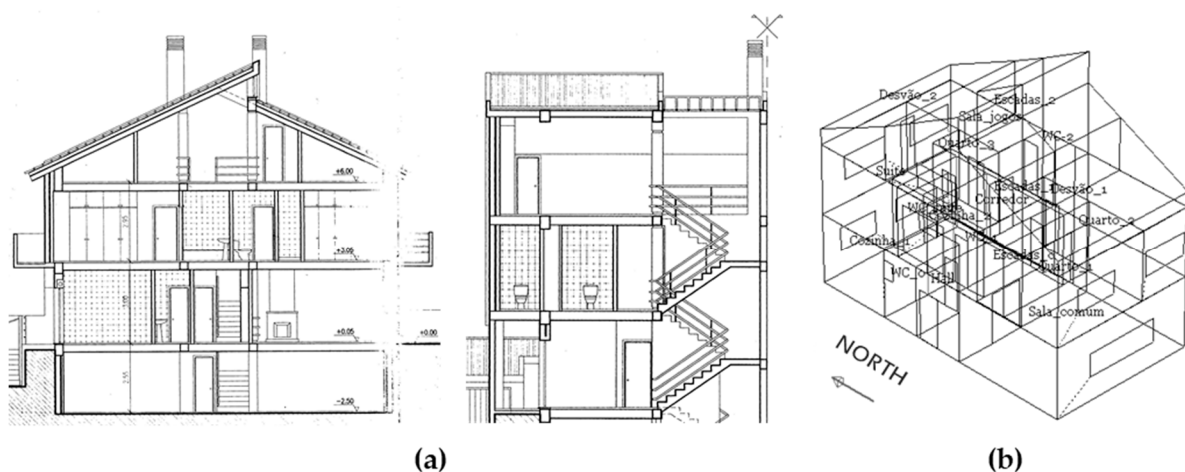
(a) Building sections, and (b) a 3D model of the simulated building.
